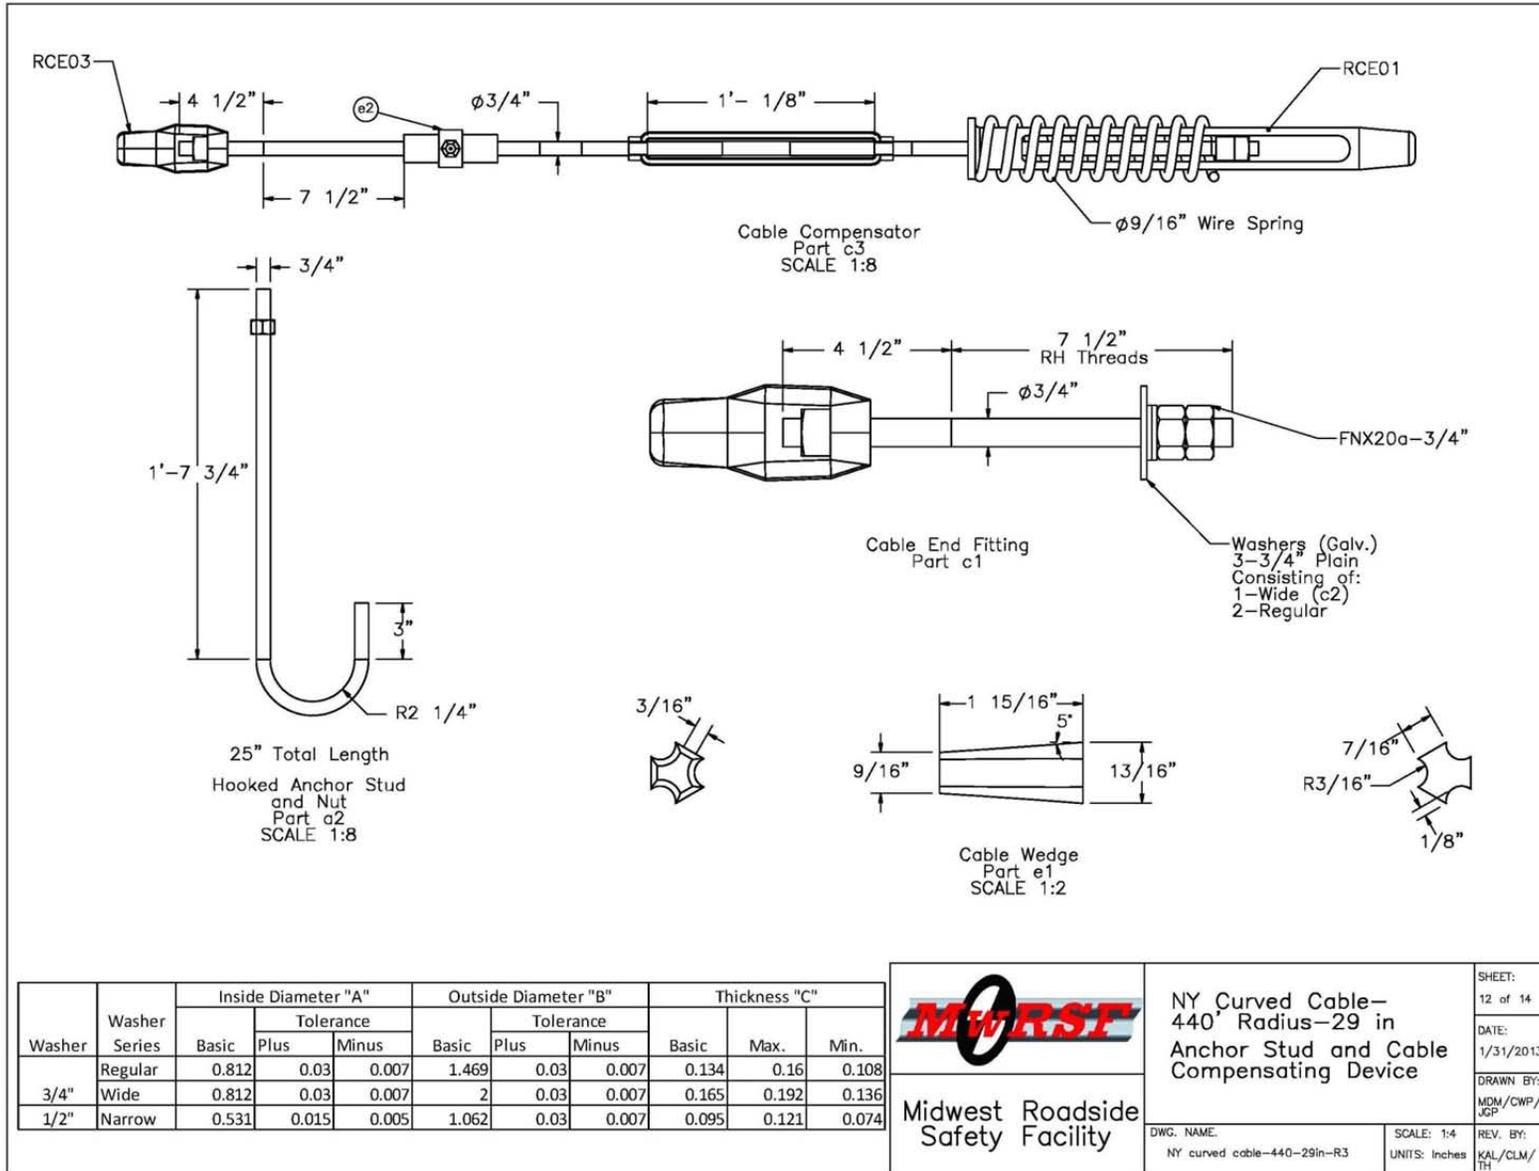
Cable Compensator Component Details, Test No. NYCC-3
